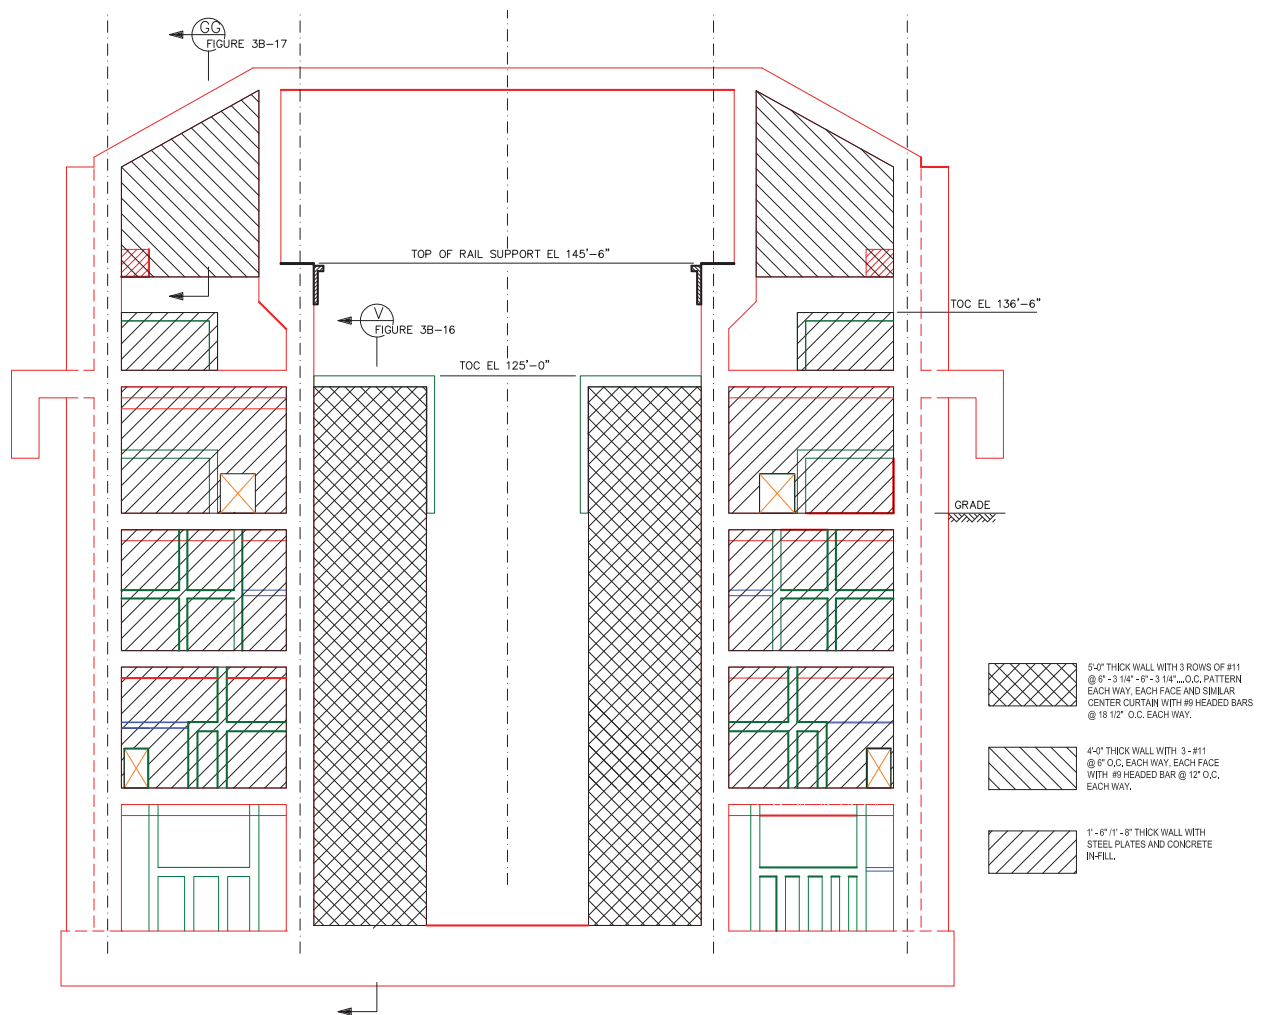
B-13: RXB Reinforcement Section View of Stiffener Wall on Grid Line 3
